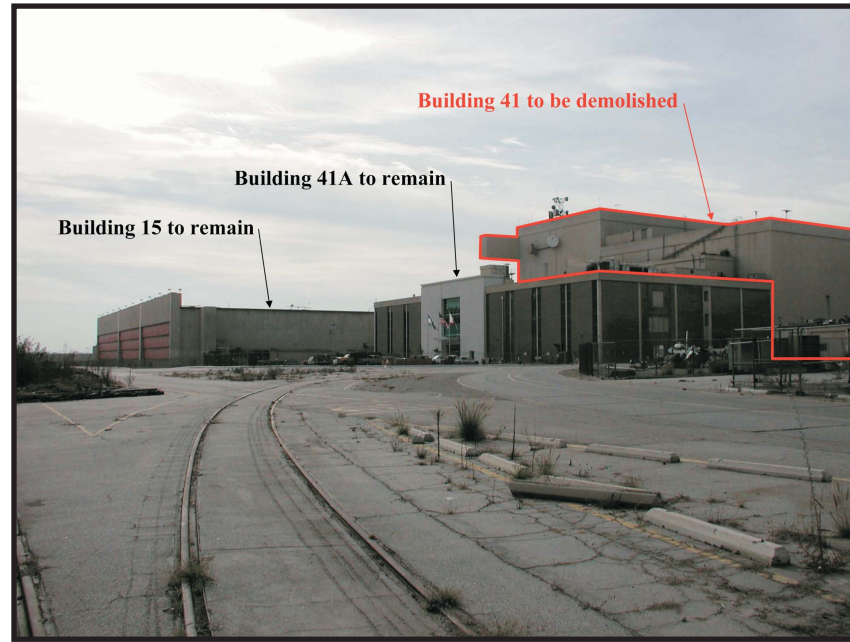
View of on-site development along Carson Street, looking east toward Lakewood Boulevard (prior to the commencement of demolition activities).
